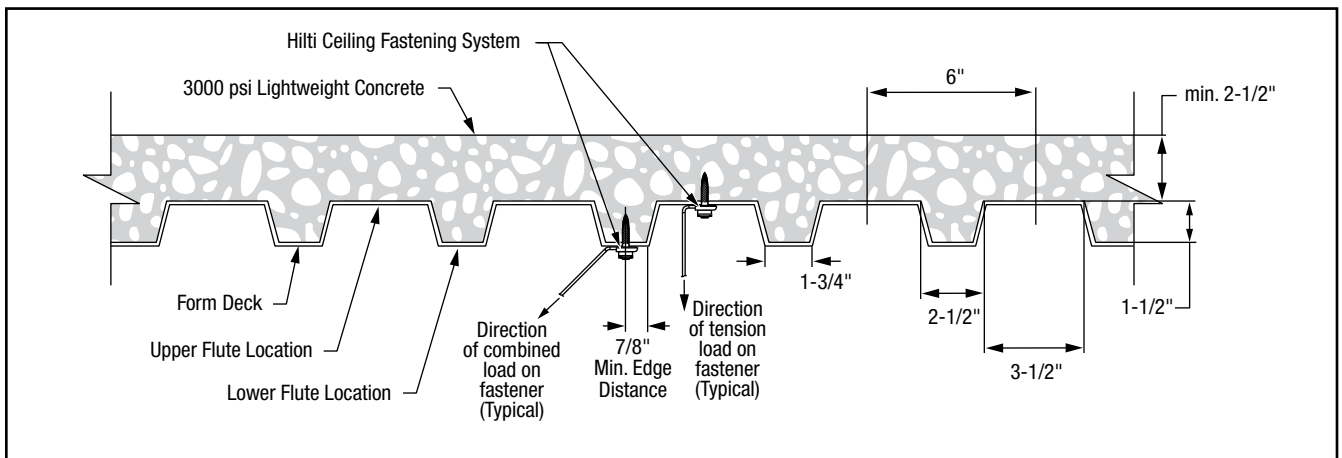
Hilti Ceiling Fastening System Location in 1-1/2-in.-Deep Composite Floor Deck, Normal Deck Profile Orientation
